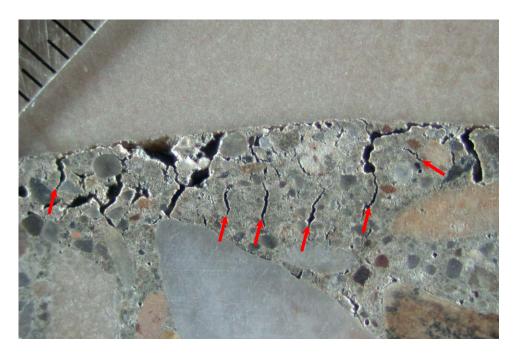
Magnified view of crack on top surface of Core #4TP. Note discontinuous, tear-like appearance of crack.
